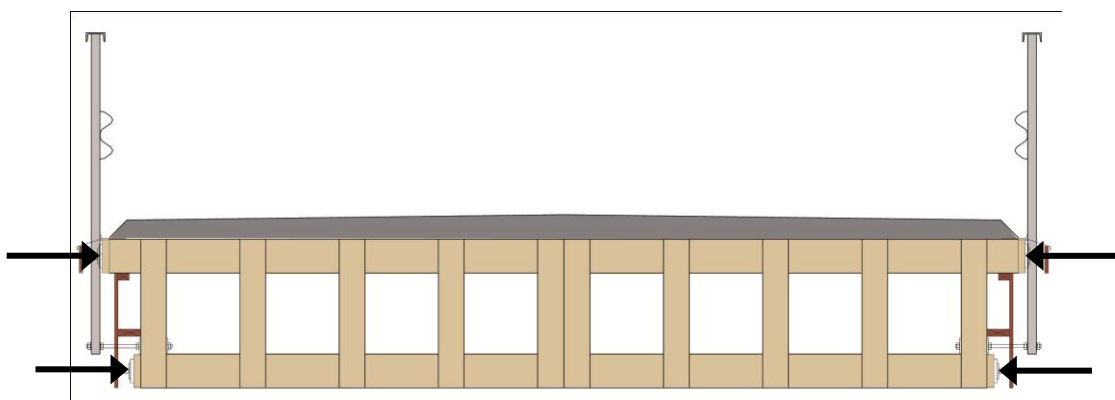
Cross-section of a box bridge with placement of pre-stressing force indicated, Träbroguiden (2010).
